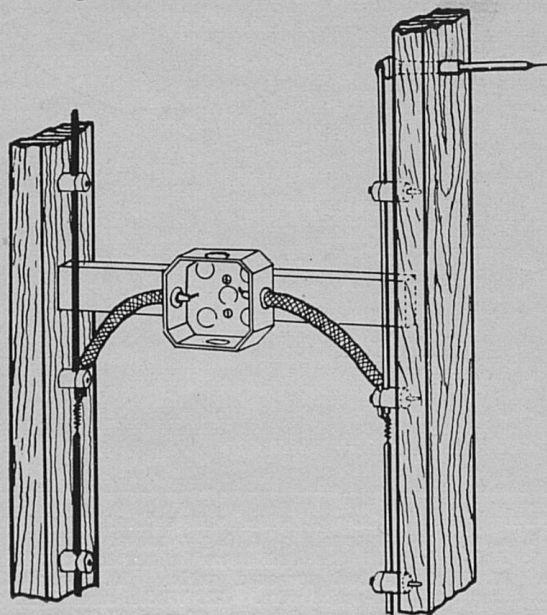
Metal outlet box for knob-and-tube wiring.
